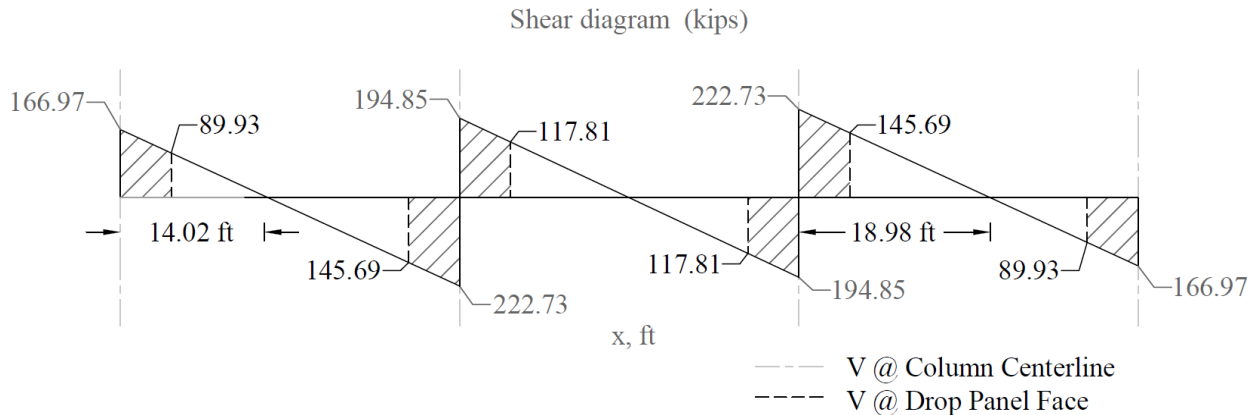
One-Way Shear at Critical Sections (at the Face of the Drop Panel)
